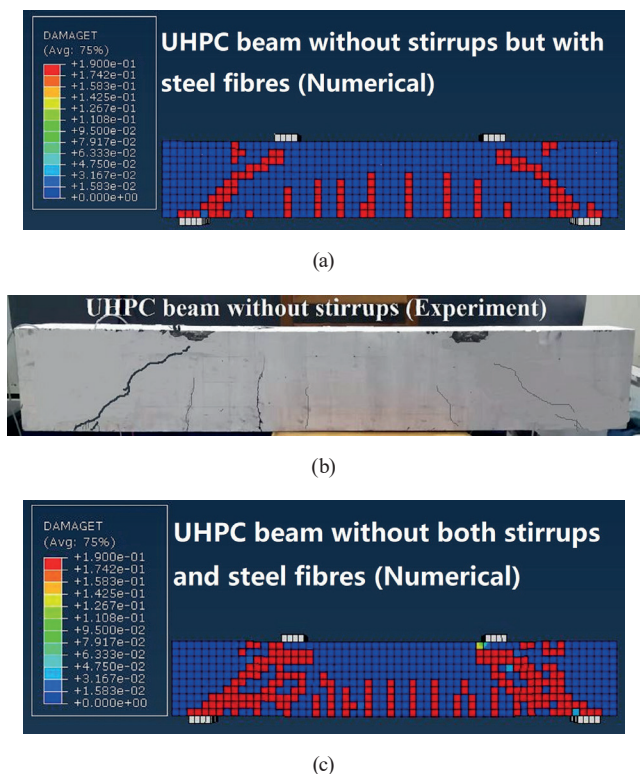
(a) Crack pattern of UHPC beam without stirrups but with steel fibers (Numerical), (b) Crack pattern of UHPC beam without stirrups (Experiment), (c) Crack pattern of UHPC beam without both stirrups and steel fibers (Numerical)
